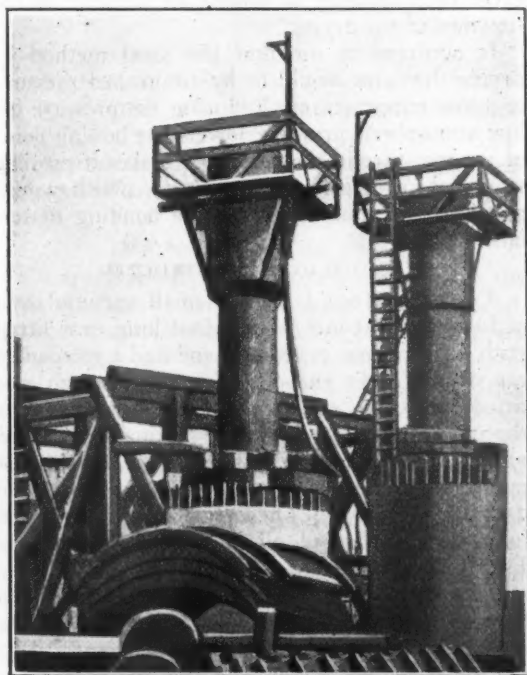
CAISSONS SUNK THROUGH SHIFTING GROUND.
